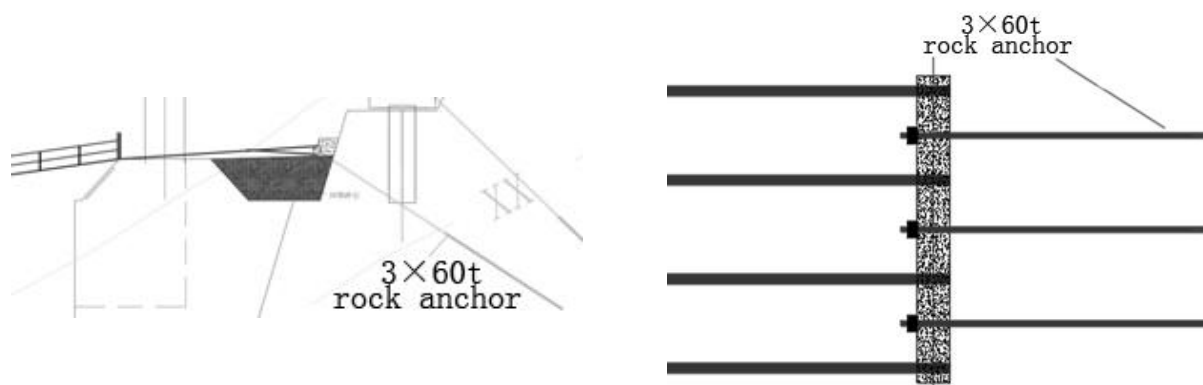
The structure of anchor block for the export port of Baifu river cable bridge
